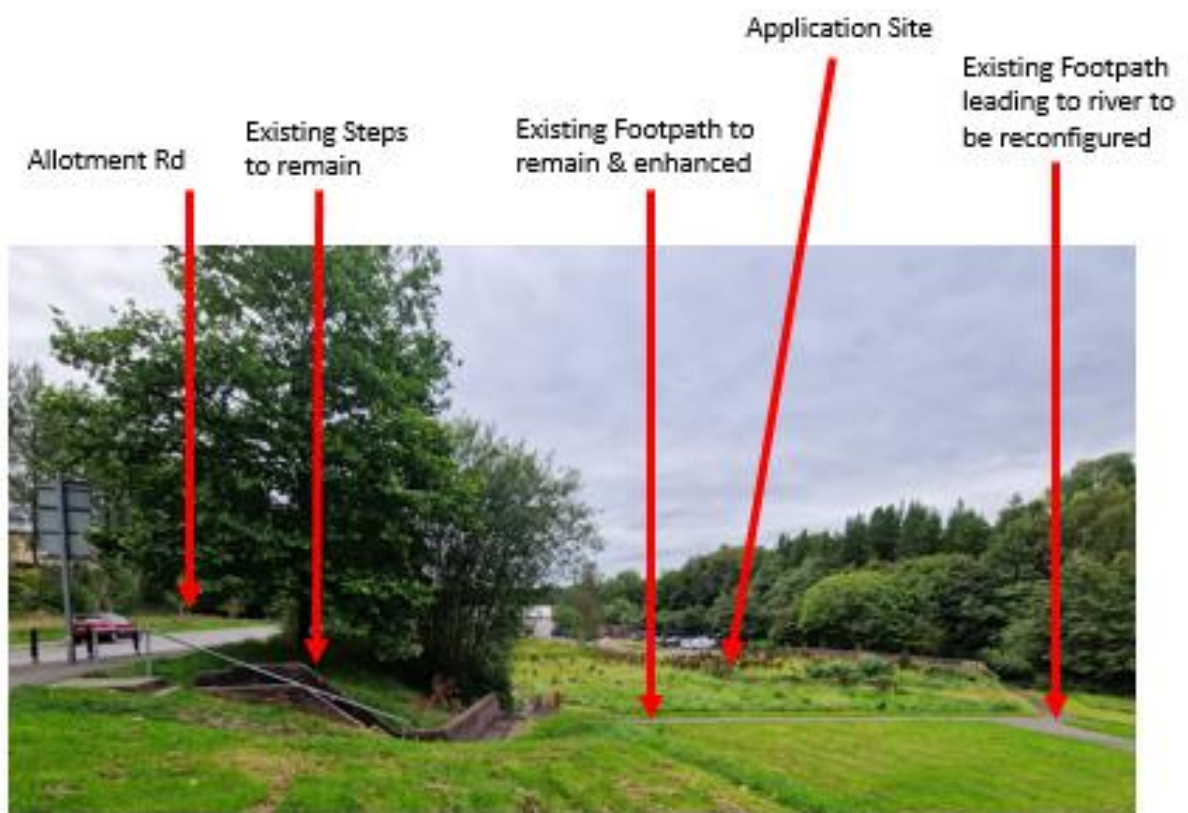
View of the site looking north-west from the adjacent open space (at Allotment Road level)
